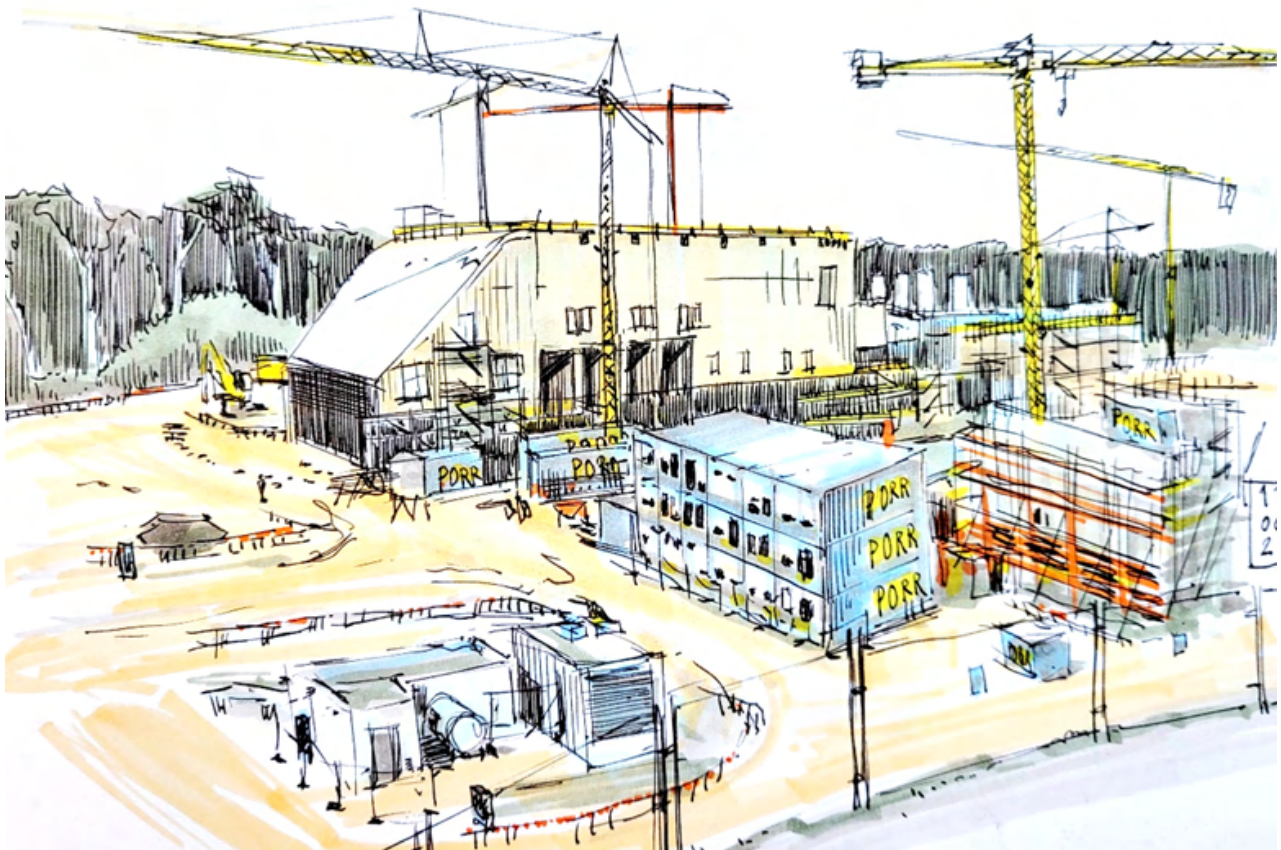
Part of the FAIR construction site in Darmstadt, Germany
